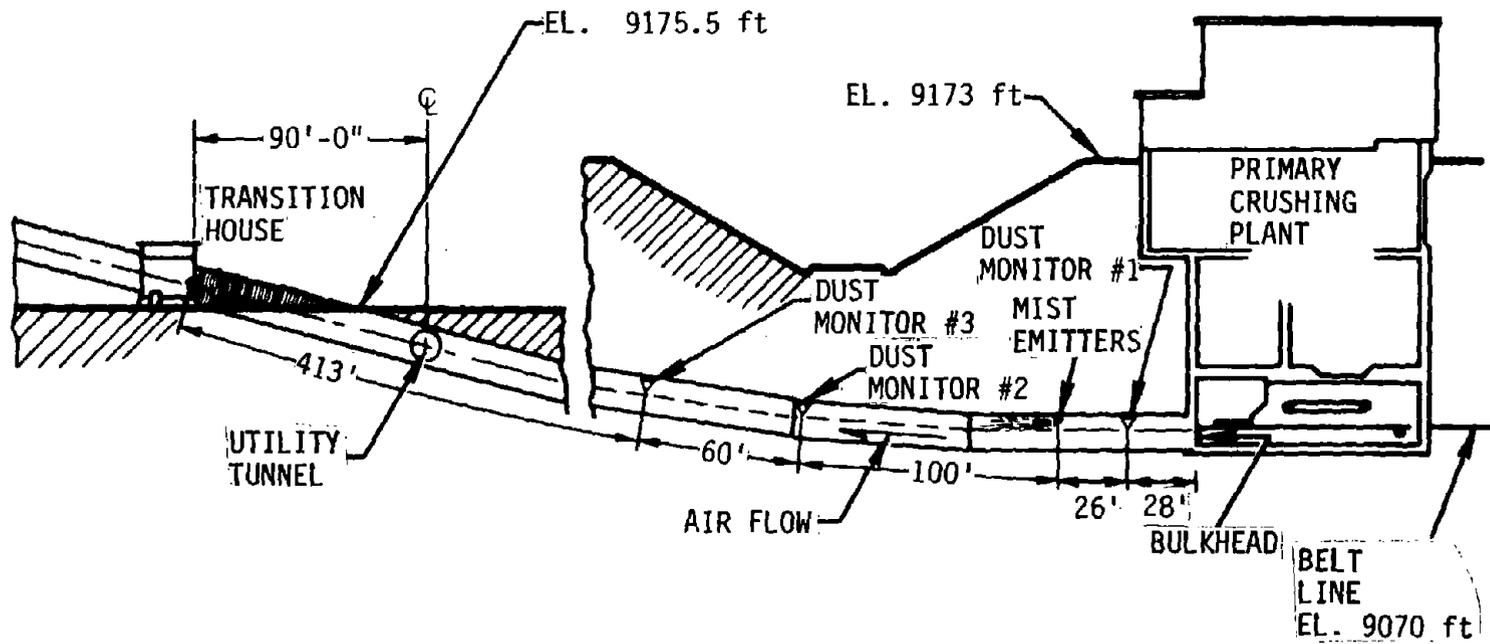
General mill site arrangement belt conveyor no. 1 elevation.
